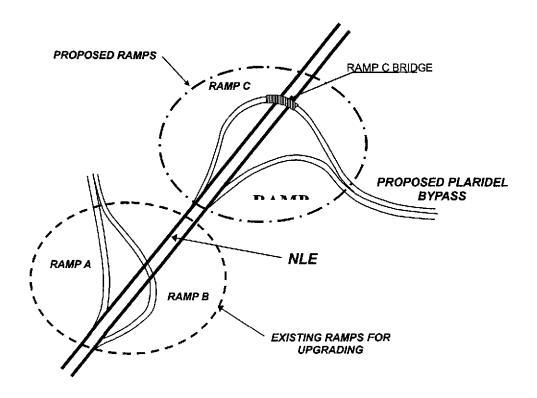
PLARIDEL BYPASS PROPOSED INTERCHANGE
